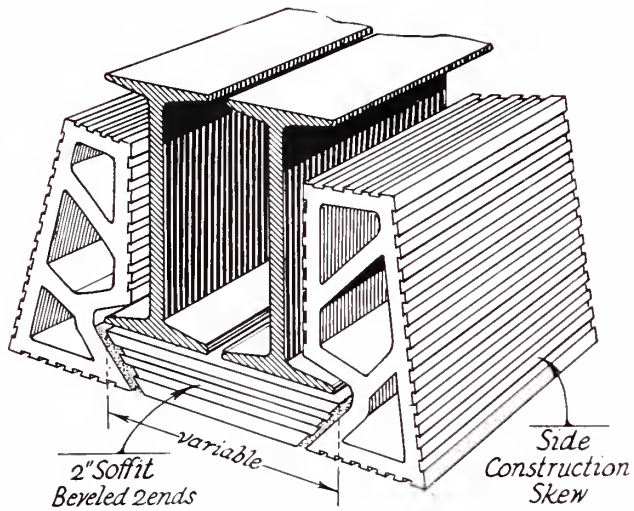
Illustrating method of protecting double beams supporting end construction flat arch floor with side construction skews.
